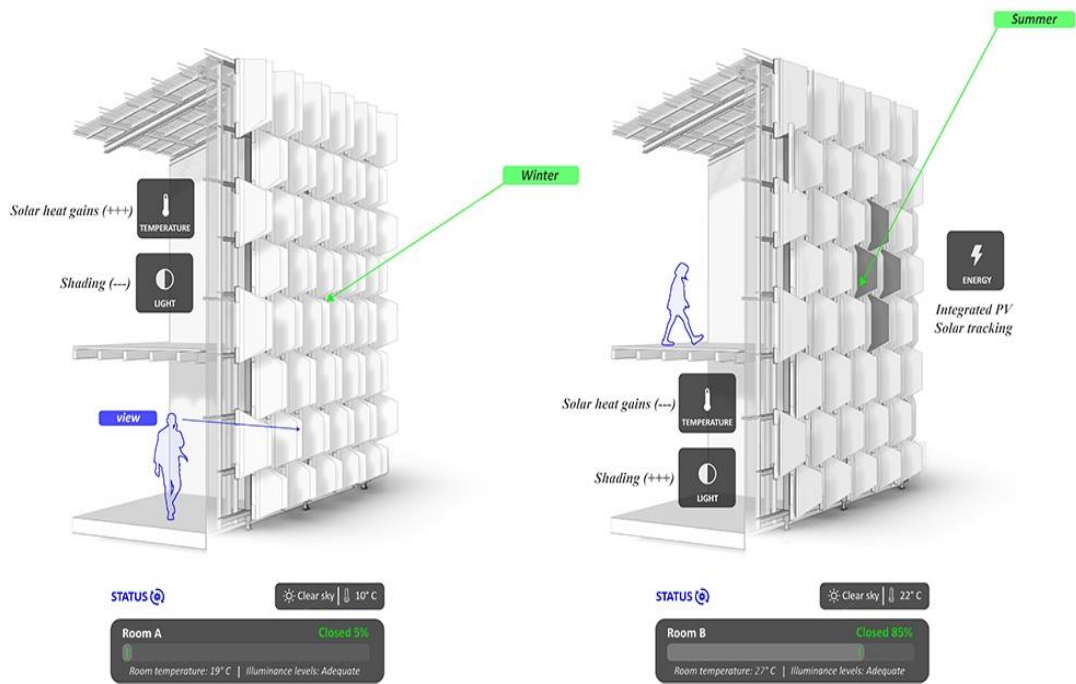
Axonometric Section of Façade in Two Seasons (University of Stuttgart, Institute of Building Structures and Structural Design, 2024).
